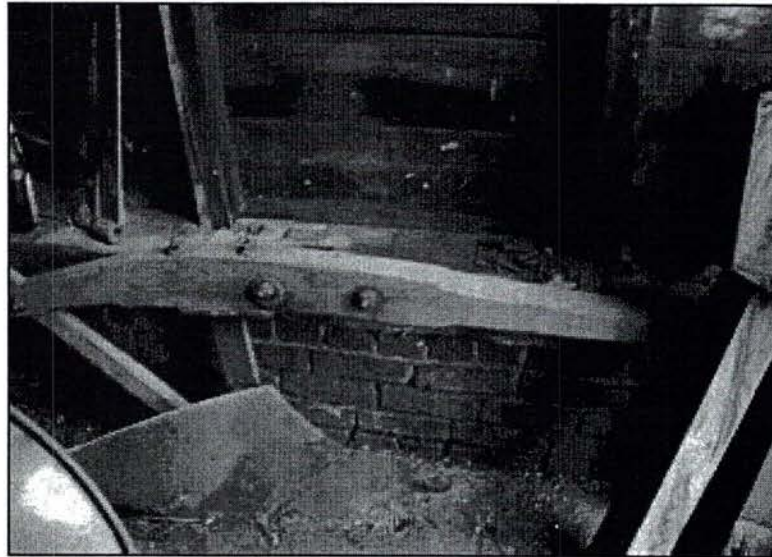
Brick foundation visible between the bays of the Carriage House. The visible foundations have open joints.
